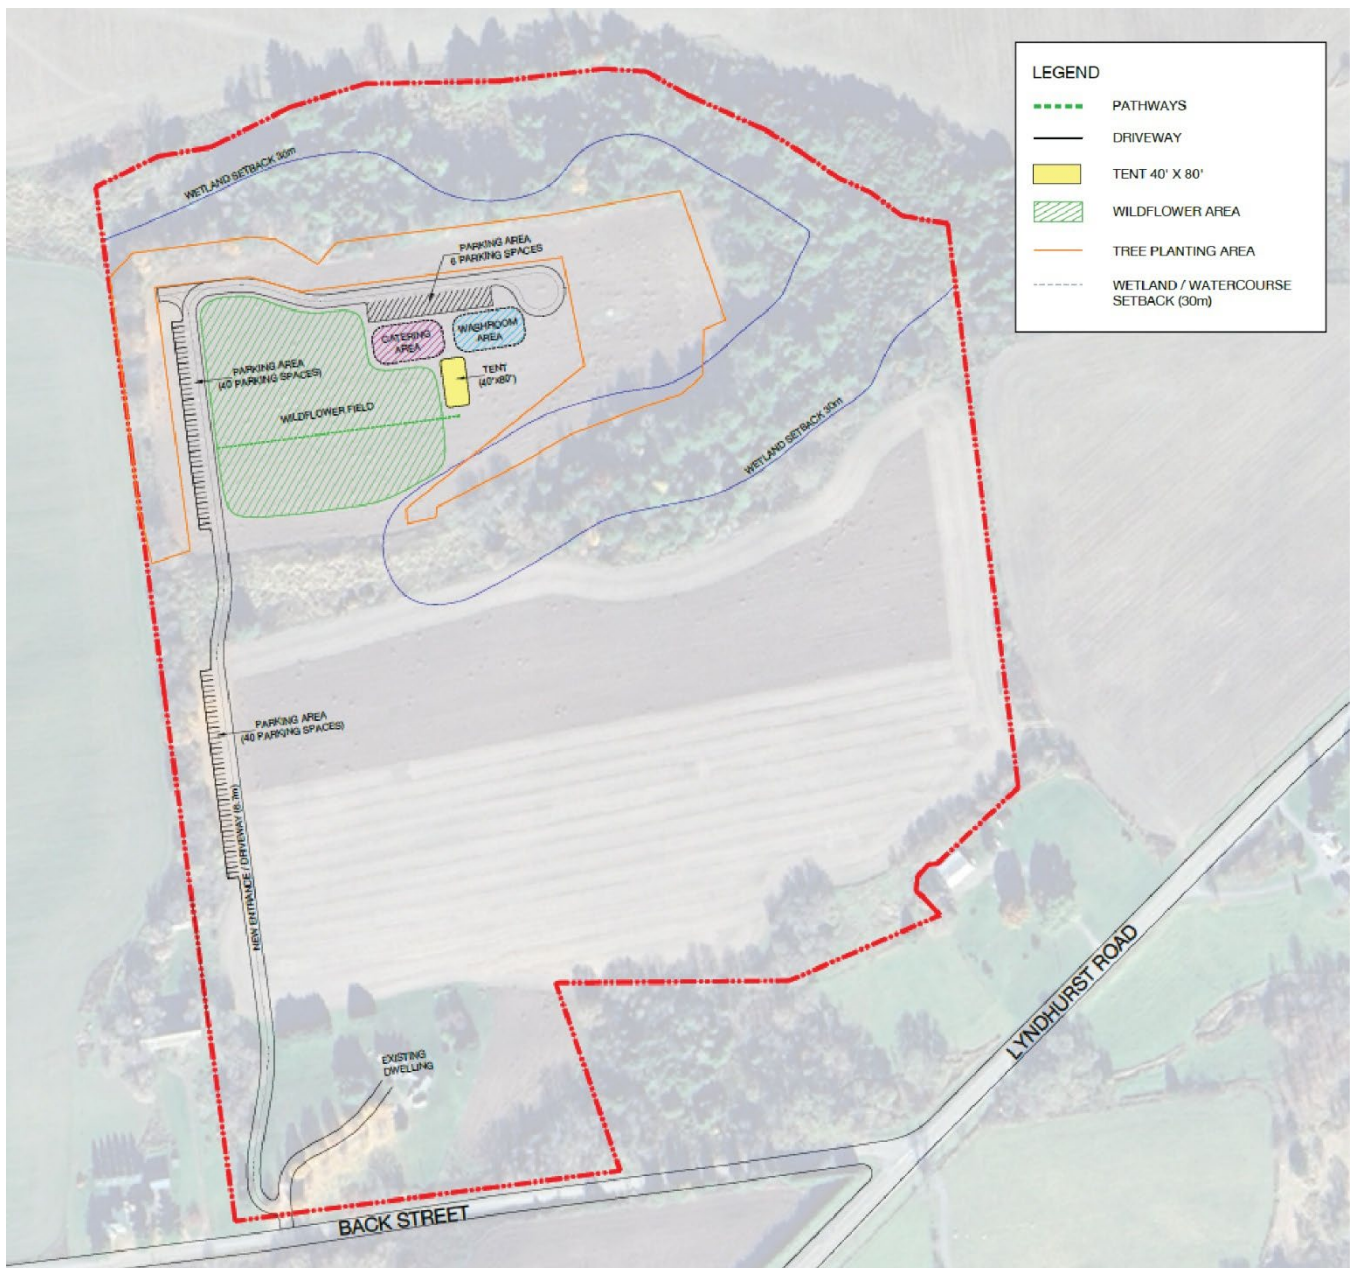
Concept Plan (Source: Fotenn Planning + Design)
